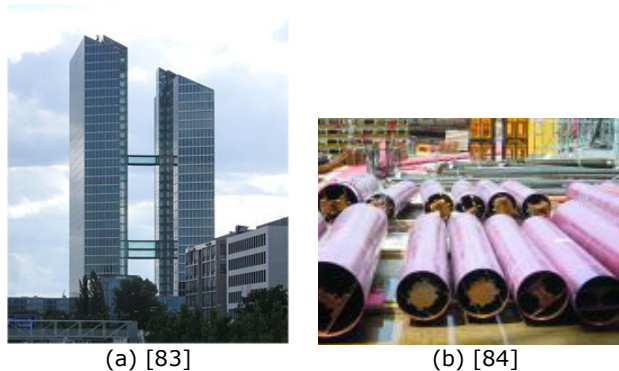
HighLight Towers in Munich (a), and cross section of columns (b)
